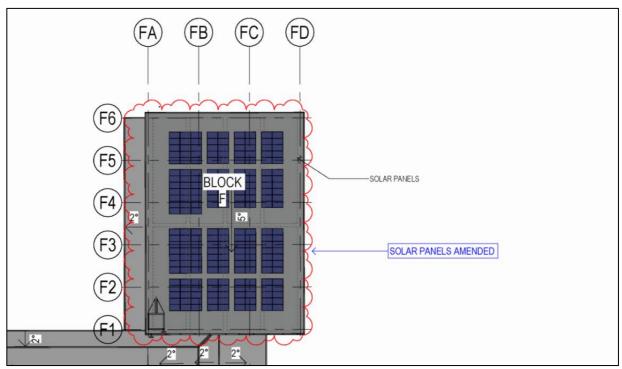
PROPOSED SOLAR PANEL LAYOUT AT BLOCK F
